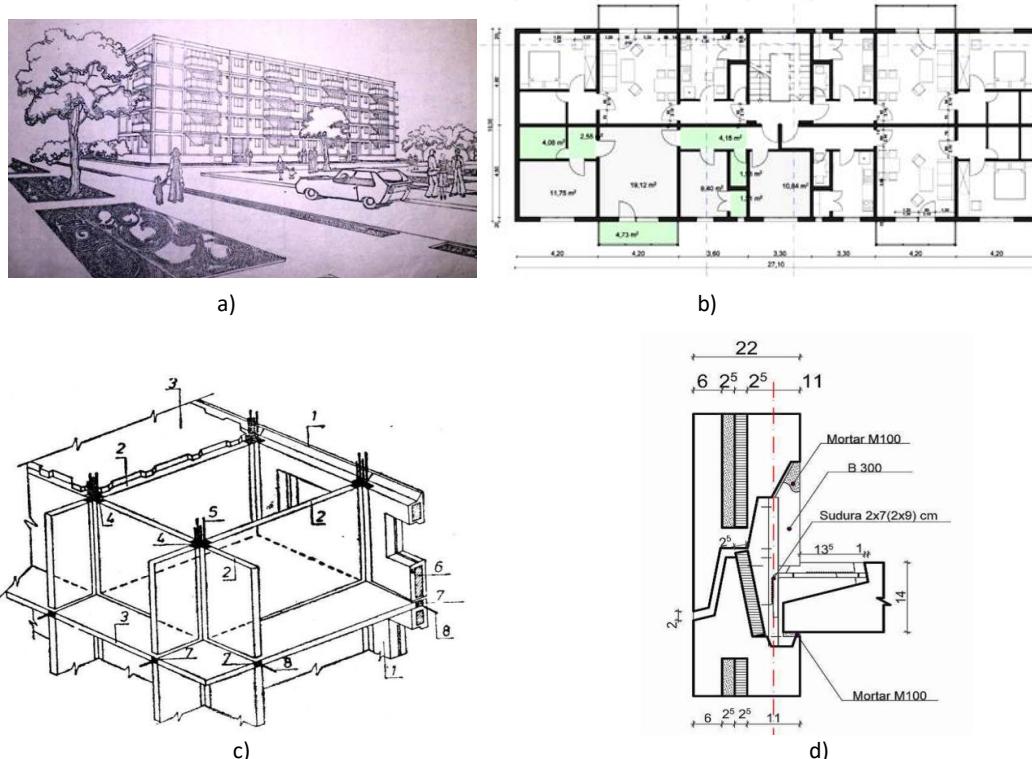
T744R-IPCT: a) general layout; b) currently used floor partition; c) system scheme; d) external joint detail (Botici et al., 2011).
